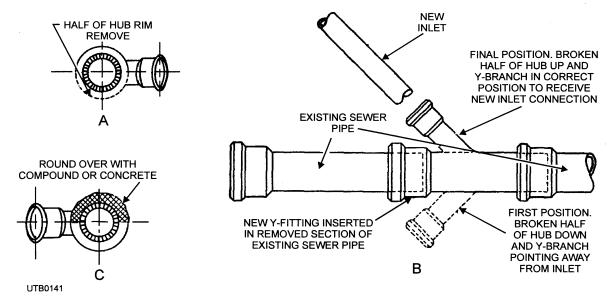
Adding connections to an outside vitrified clay sewer pipe.
